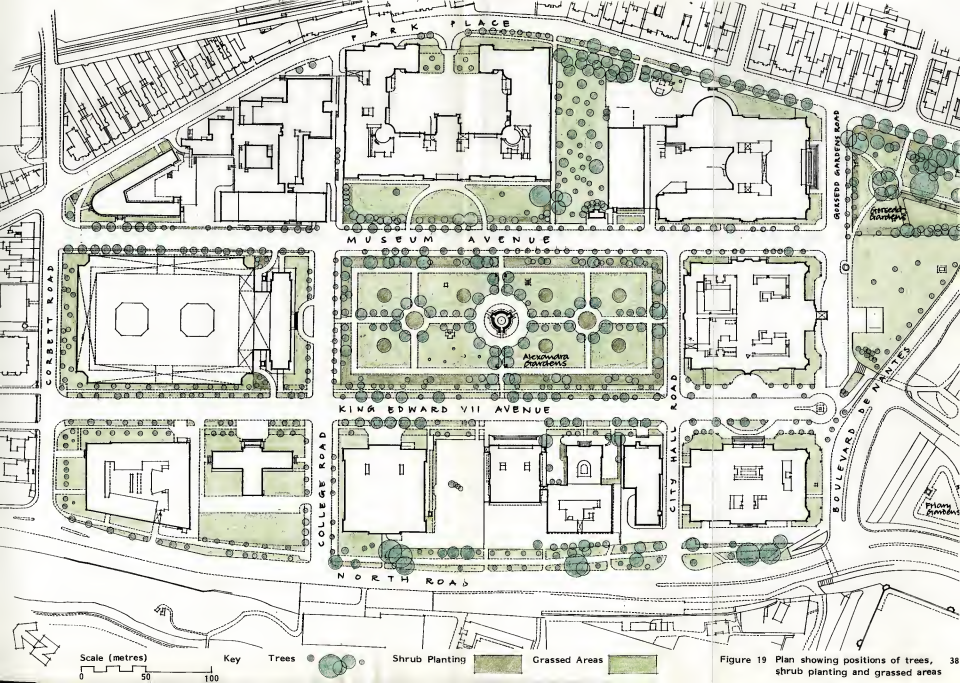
Plan showing positions of trees, shrub planting and grassed areas 38
